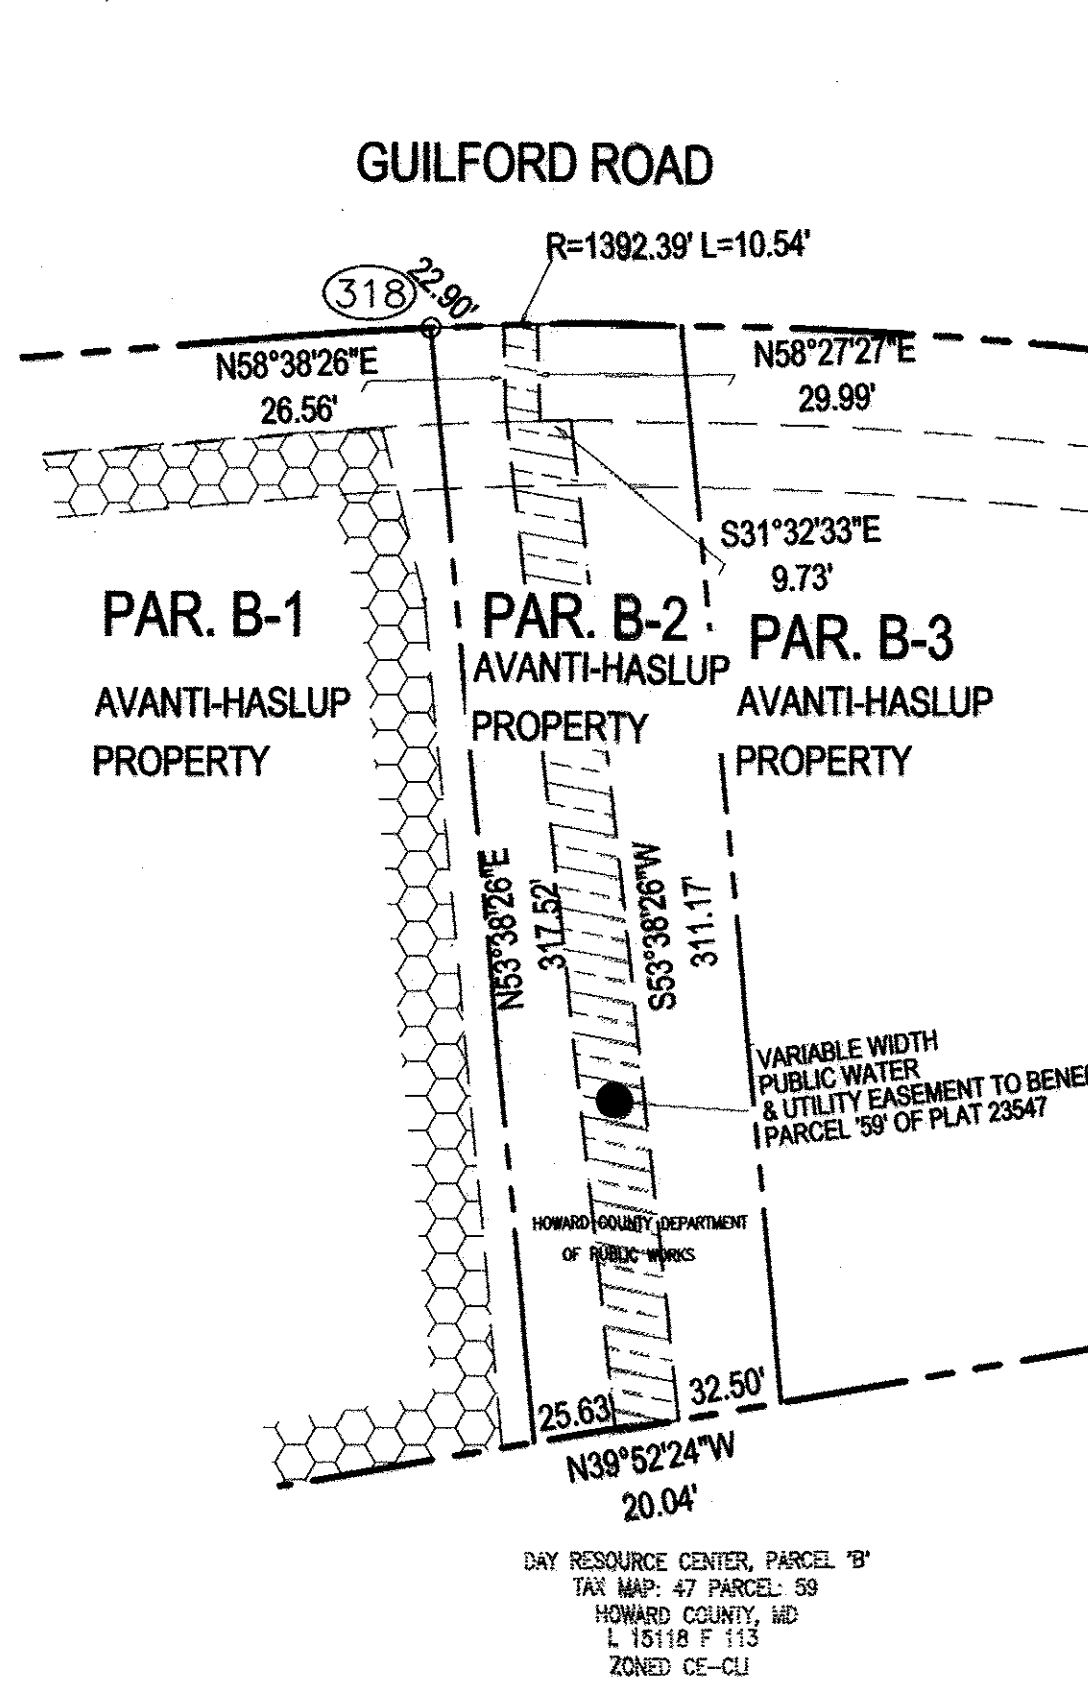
DETAIL OF PRIVATE SEWER & UTILITY EASEMENT
